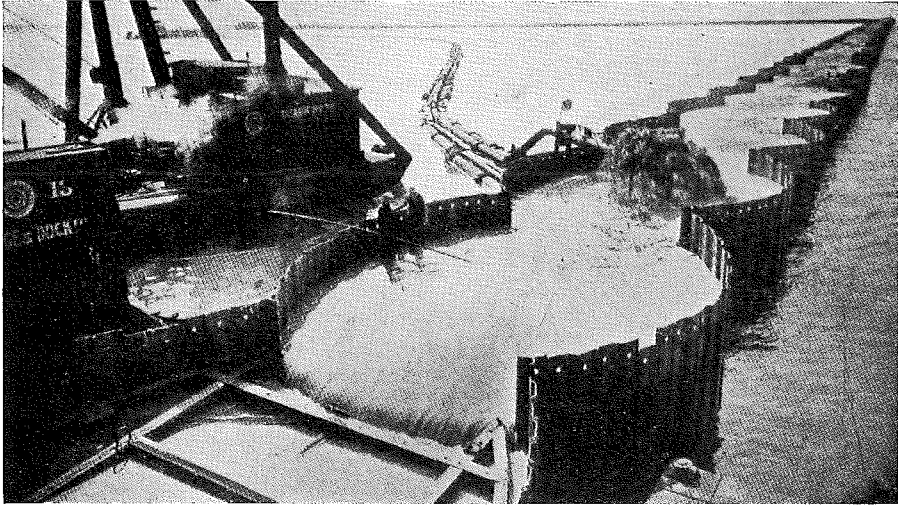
FILLING DIAPHRAGM TYPE CELLULAR BULKHEAD WITH DREDGED SAND.
